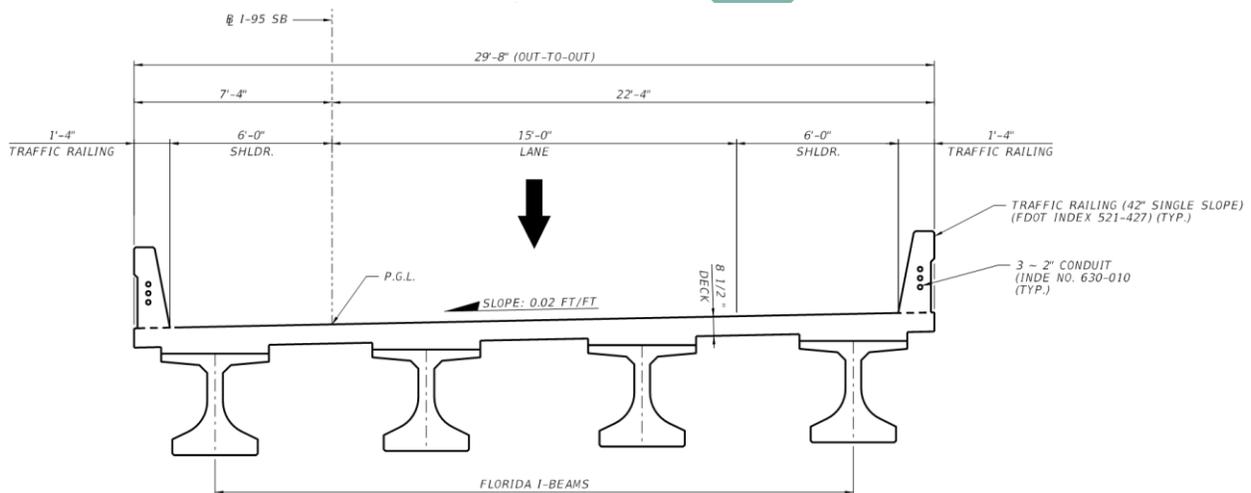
Bridge Typical Section (Bridge No. 16)
